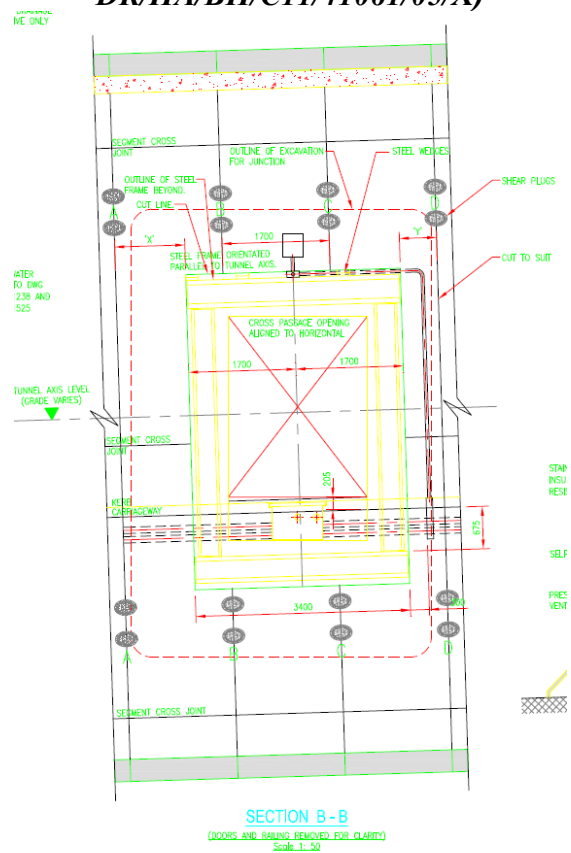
Cross section through Cross Passage Design Details (as-built drawing No. DR/HA/BH/C11/41061/05/X)
